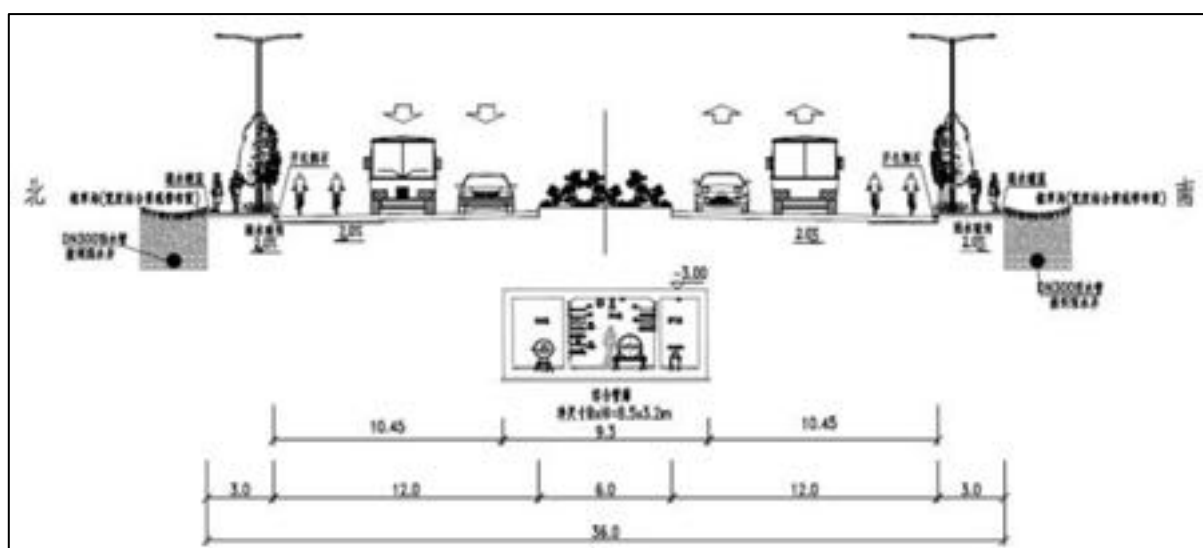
Location of SSUS under Xiangyun Road (Zhuyuan Road ~ Hucheng Avenue)
